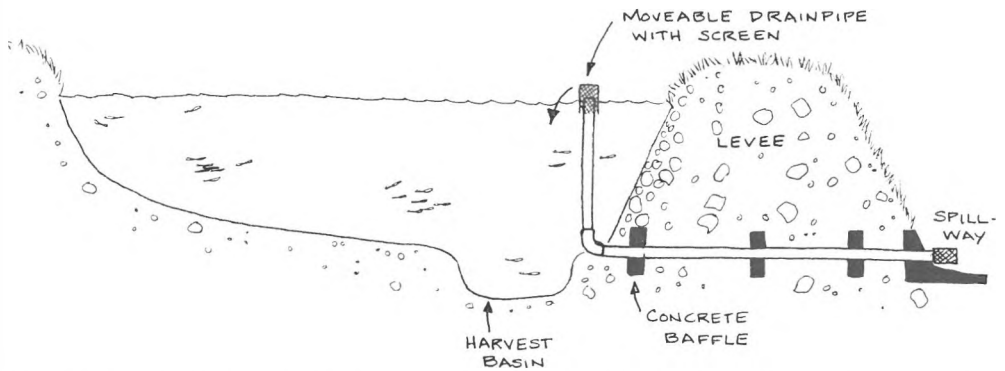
Cross-section of pond showing harvest basin, moveable drainpipe, and outlet pipe baffle.
